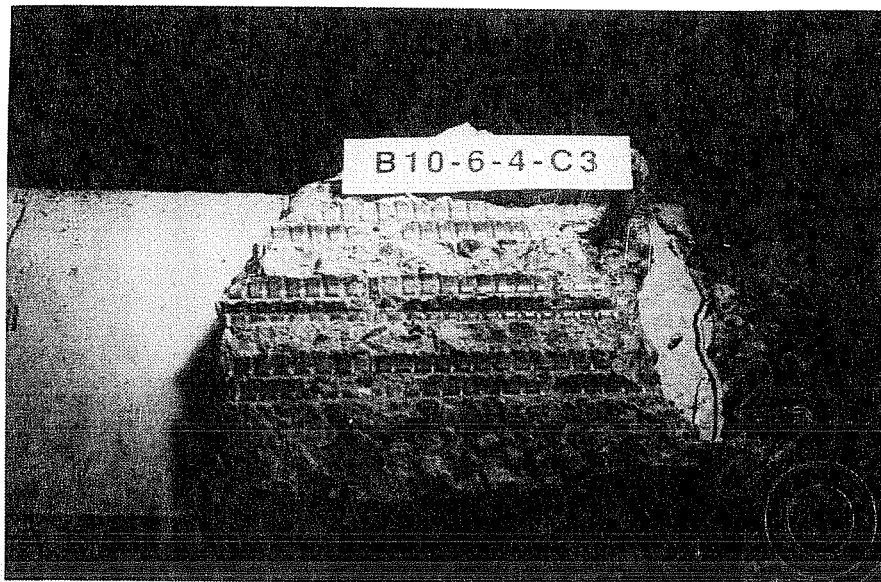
Concrete cover after splice failure, epoxy-coated bars.
